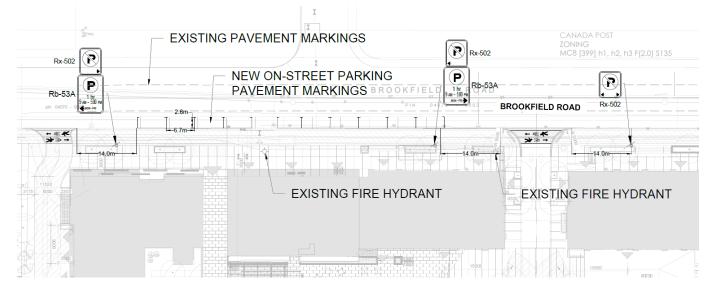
Proposed Brookfield Road On-Street Parking Arrangement
